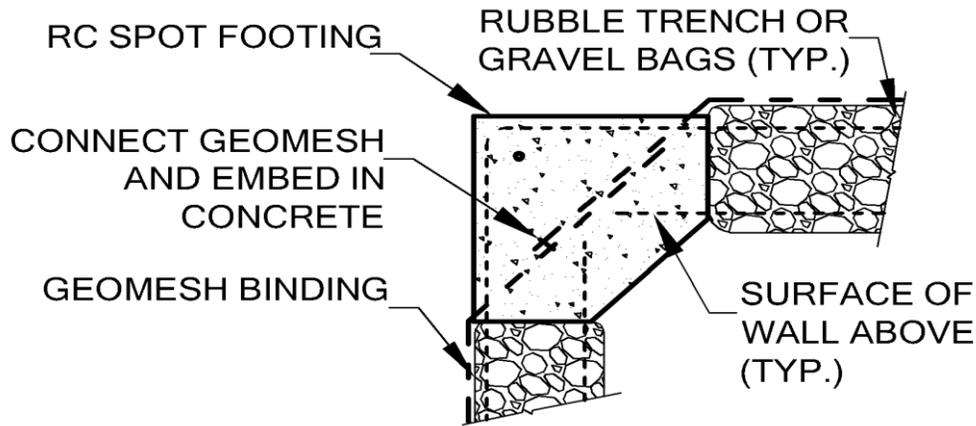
Geomesh embedded in spot footings at corners can confine adjacent gravel bag footings.
